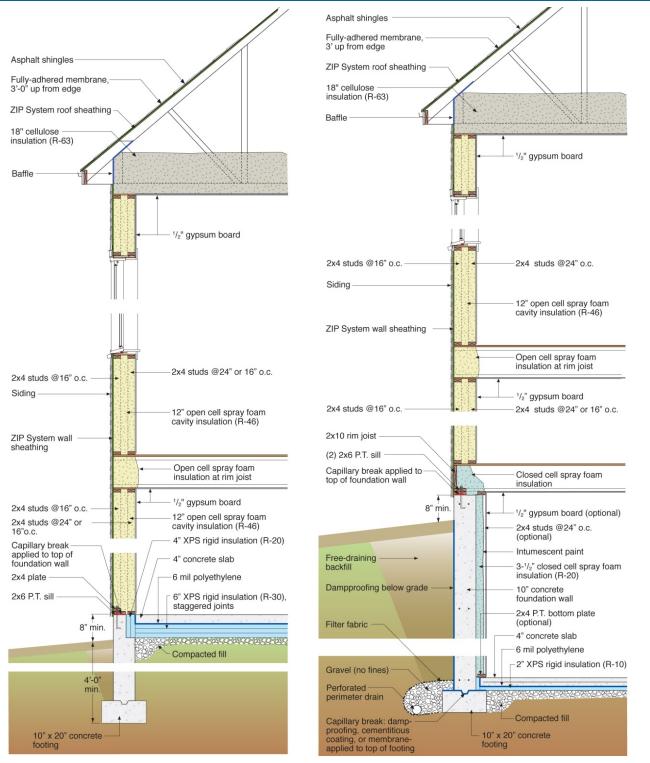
(L) Wall section with slab-on-grade; (R) basement
